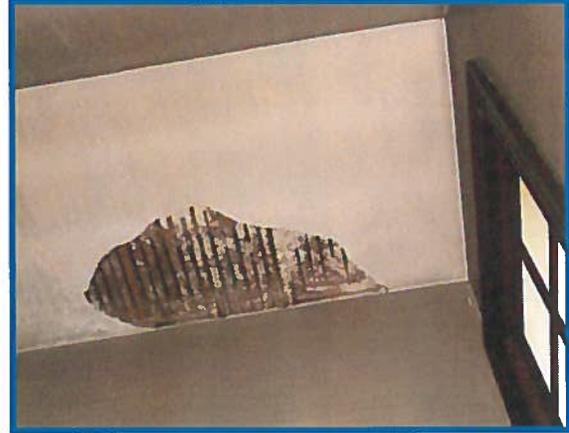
Areas in the station where plaster in walls and ceilings has been damaged and needs repair.
